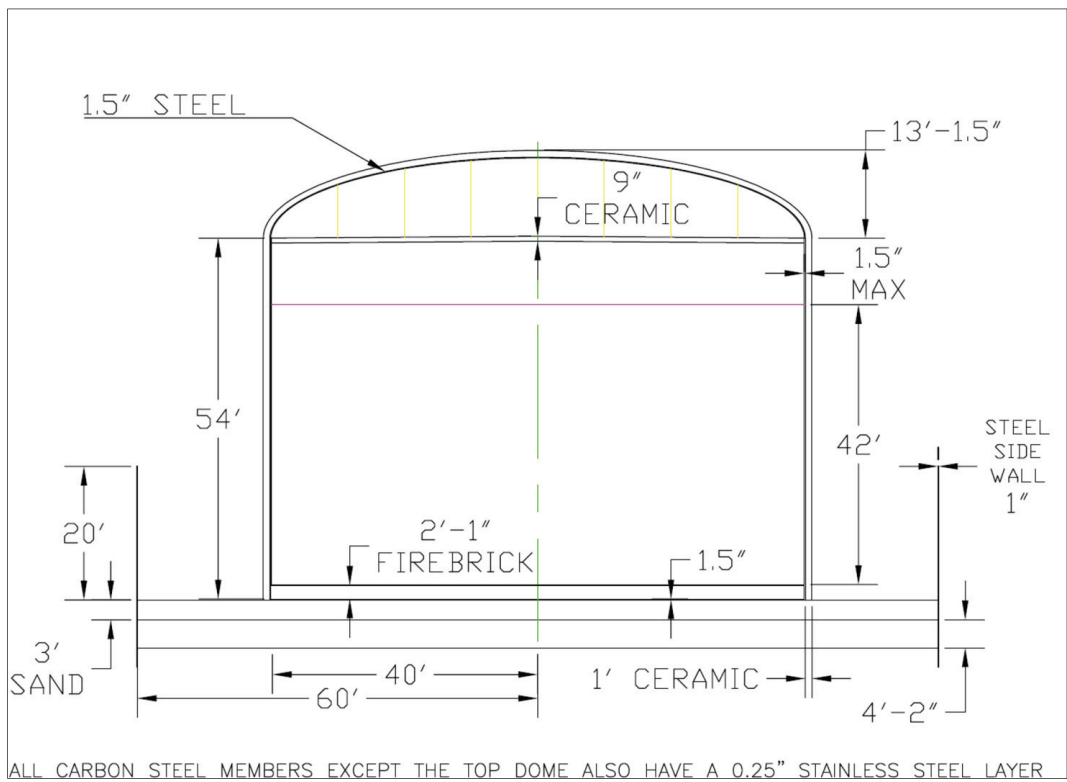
Steel cylindrical shell model design including alternative elliptical top dome, sand layer, 50" posttension slab, and safety steel walls at the edge and excluding the outer layer of insulation [10].
